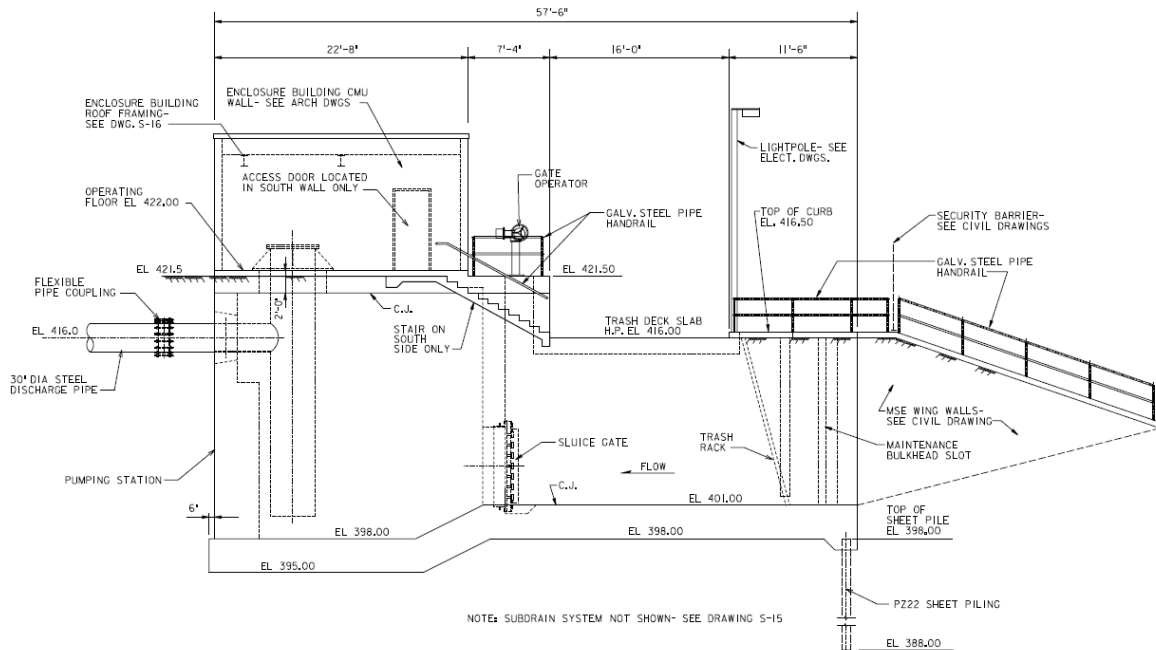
Chain of Rocks Pump Station – South Elevation
